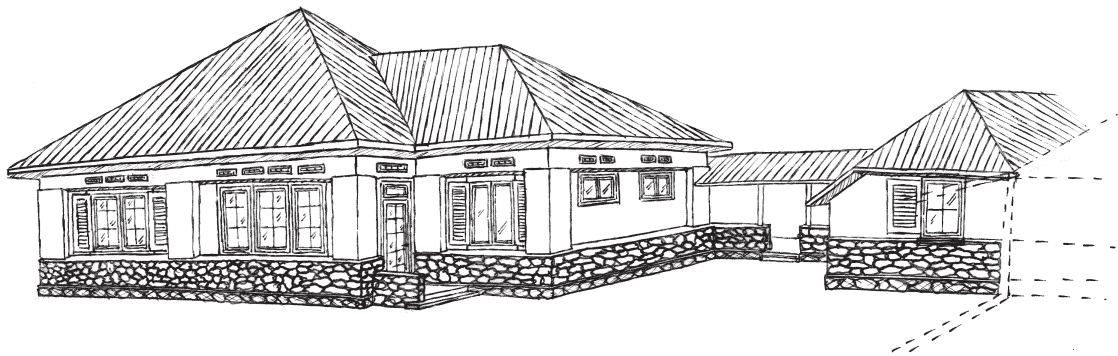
Roof construction (Gmelig Meijling, 1953, P.31)
